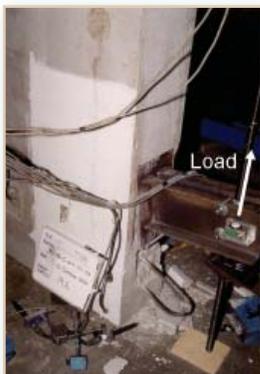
Photograph of combined tension and shear failure on an embedded column corbel plate
